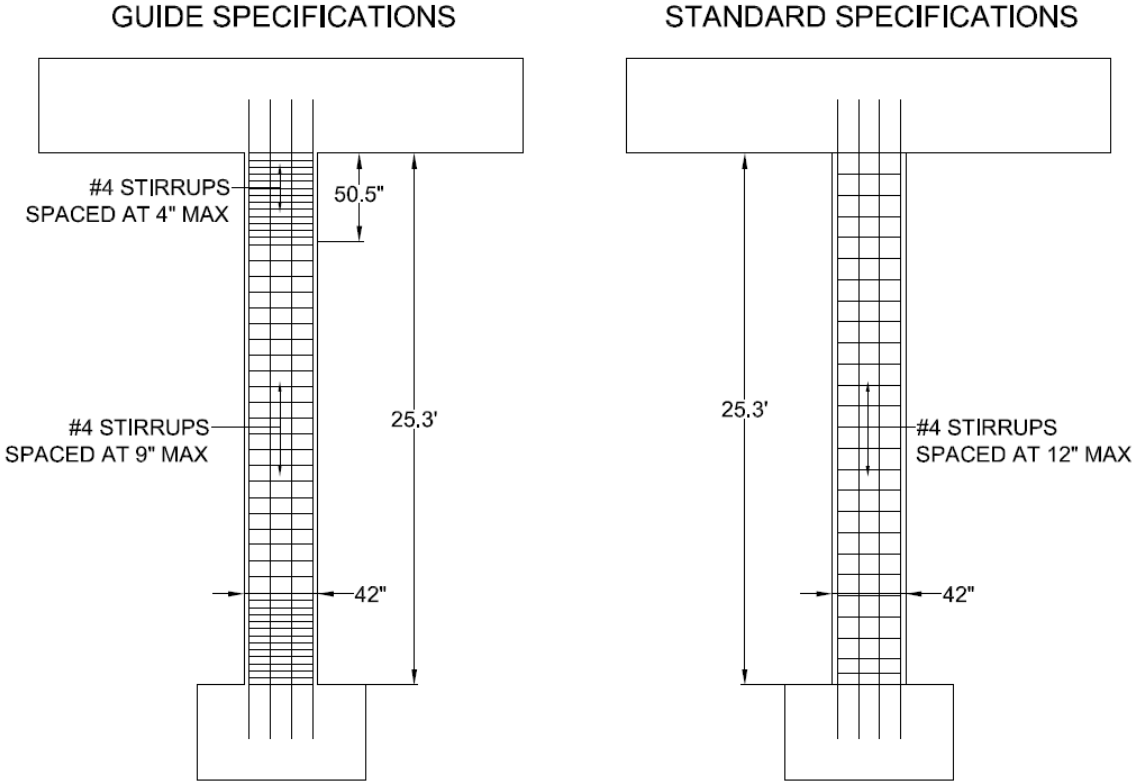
Bridge over Norfolk Southern Railroad Final Design Details (SDC A2)
